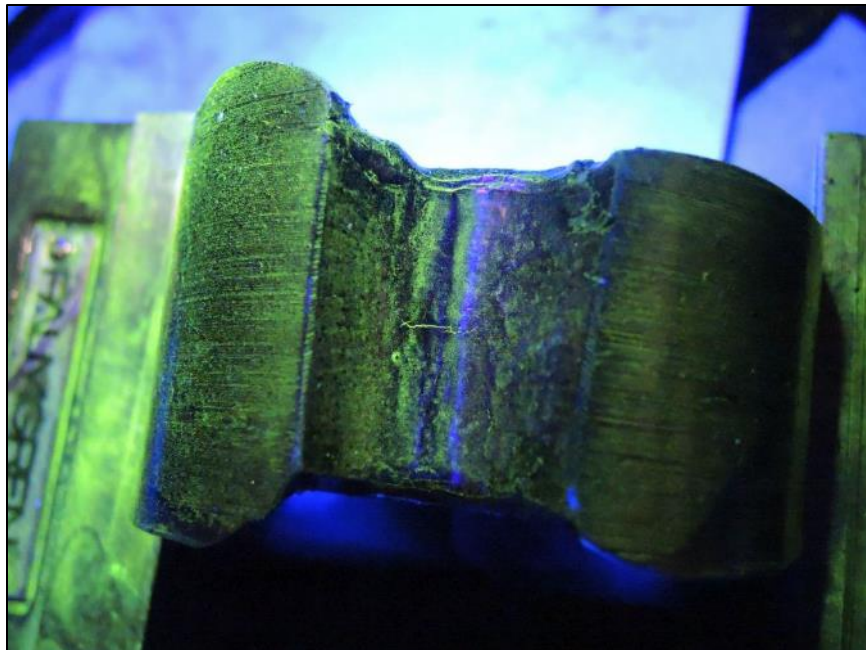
Representative image of core sample F-W, which was removed to create the new web stress relief hole, following wet fluorescent magnetic particle testing showing a crack.
